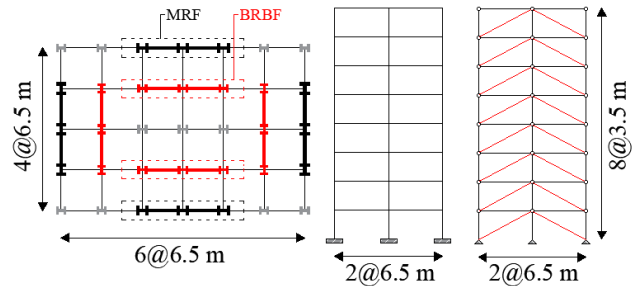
Case-study building: plan view (left) and elevation view of the MRF and BRBF (right).
